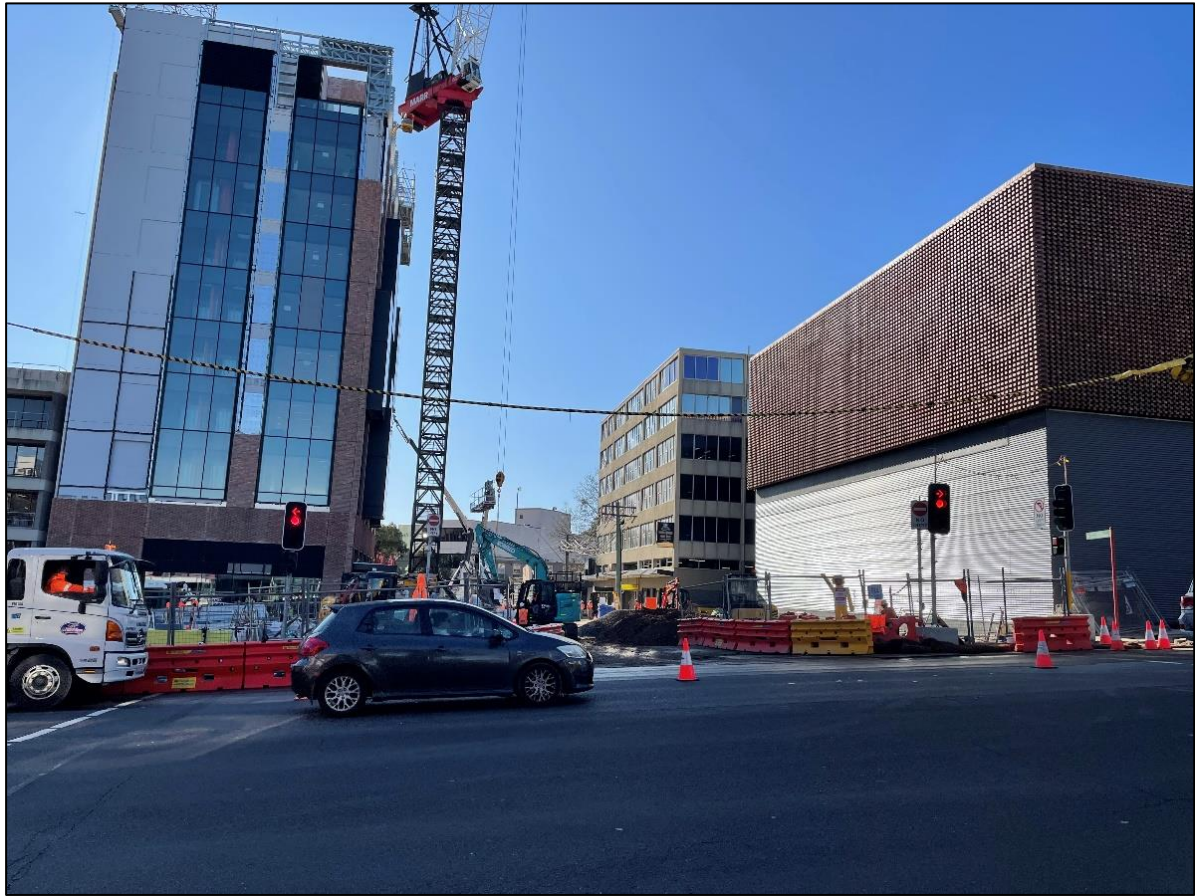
View from the corner of Hume Street and Pacific Highway looking East to Site B (July 2024)
